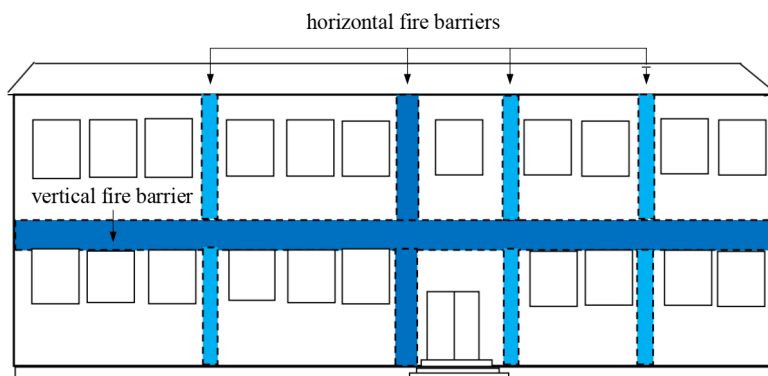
Horizontal and vertical fire barriers along the borders of fire compartment (dark blue) and the junctions of internal fire walls and external building wall (light blue) [13].
